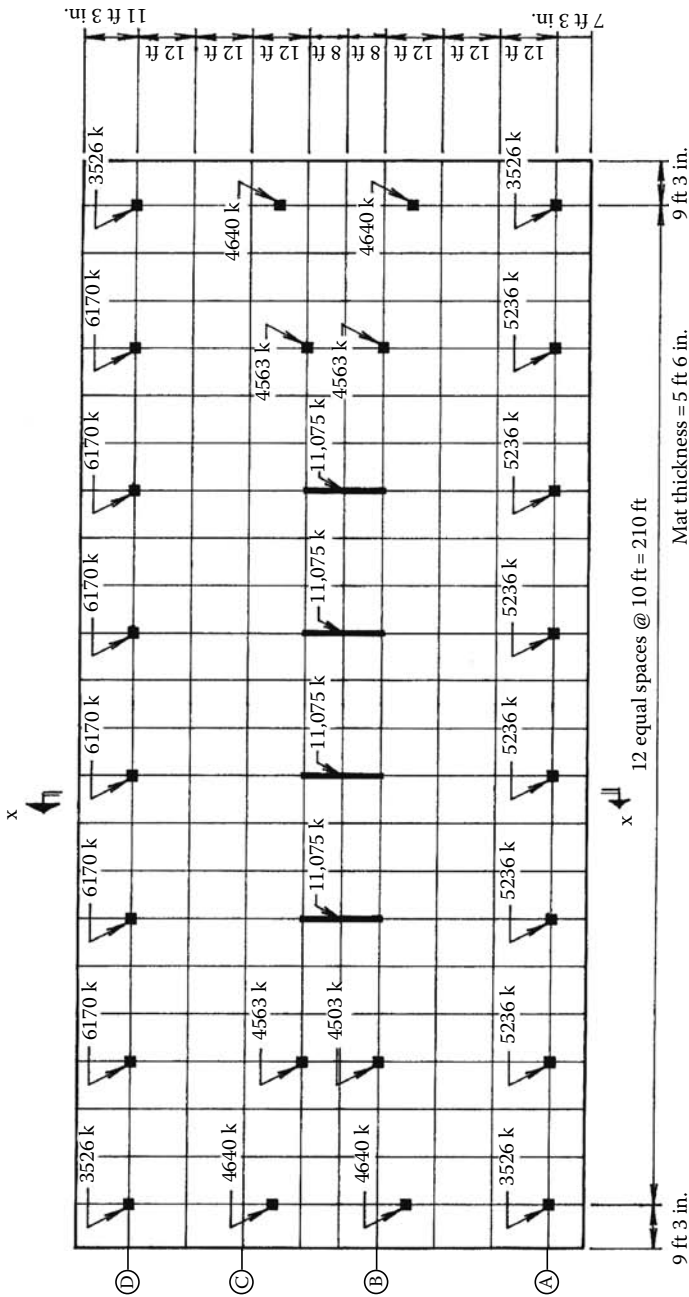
Foundation mat for a 25-story building: finite element idealization and column ultimate loads.
